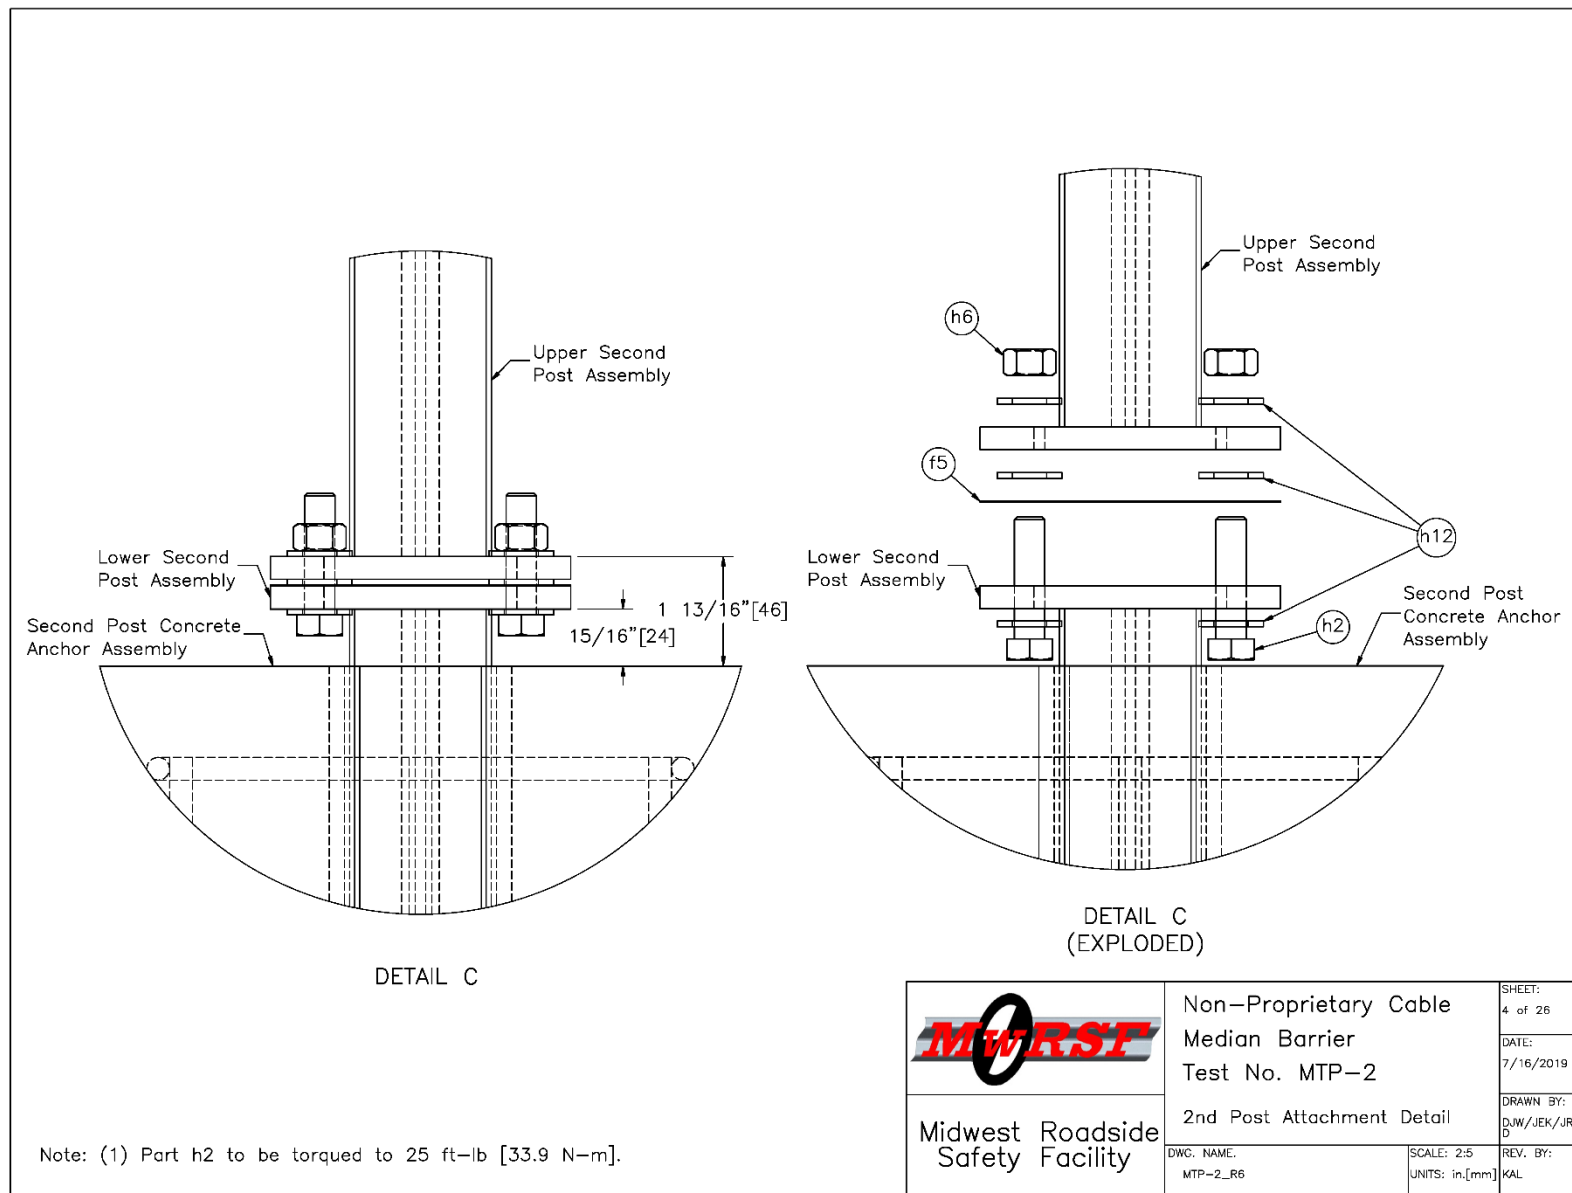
Second Post Attachment Detail, Test No. MTP-2
